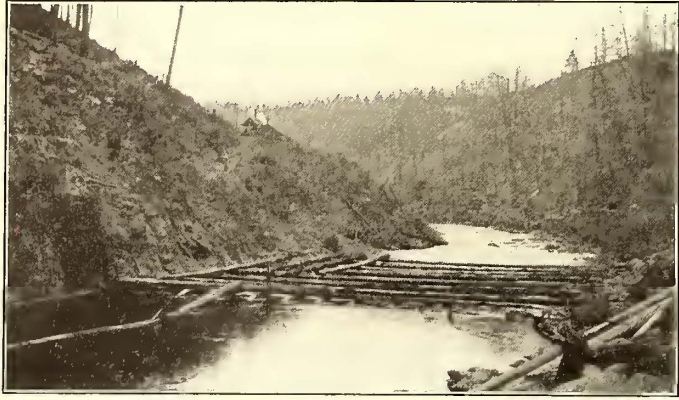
FOUNDATION CRIBS OF CAZADERO LOG DAM
